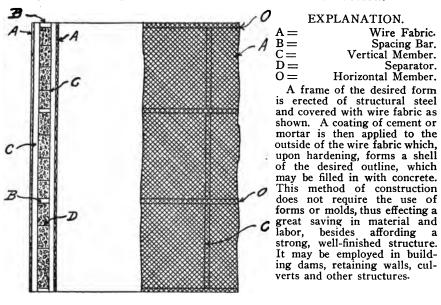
TYPICAL FORMS IN BUILDING CONSTRUCTION.
